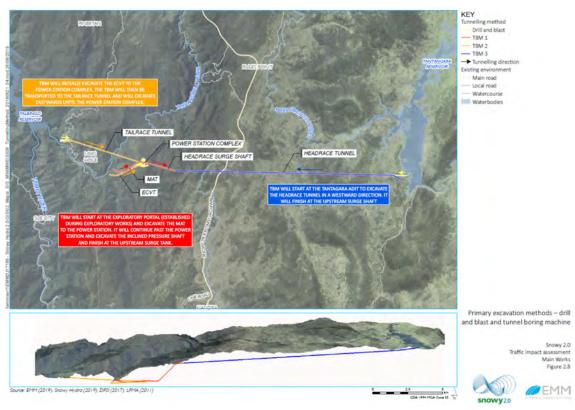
Snowy 2.0 excavation and tunnelling methods
